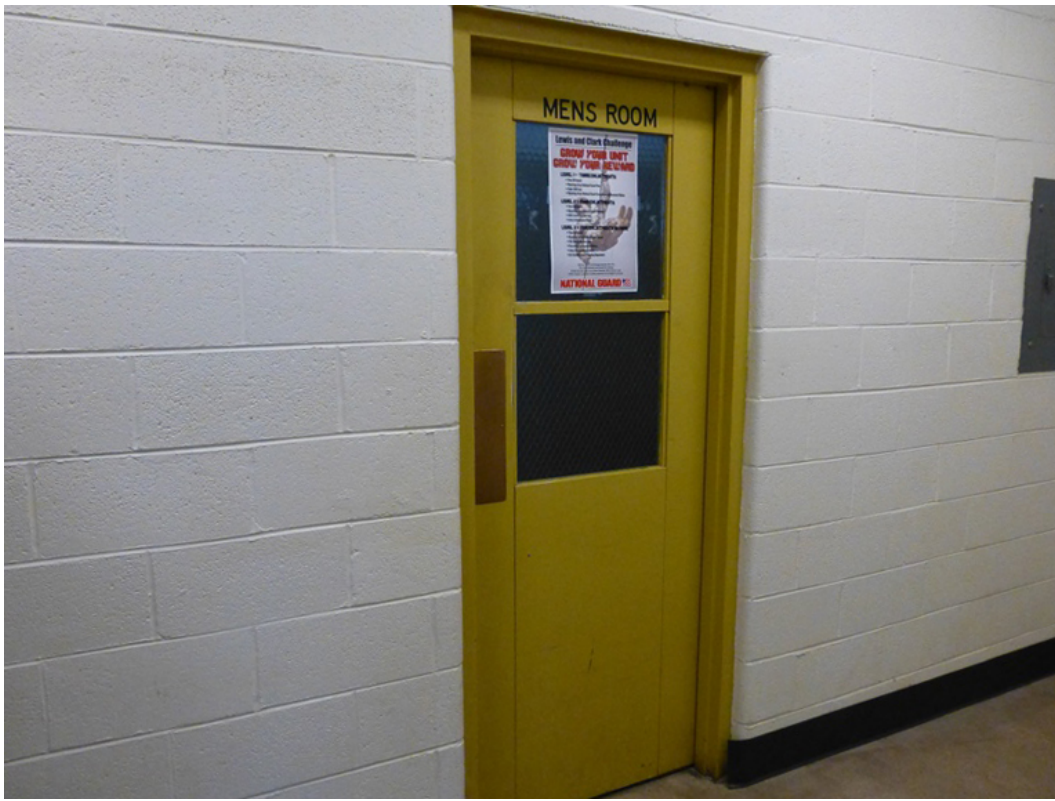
Laramie Armory, original metal door with glass panes, leading into the men's latrine (ERDC-CERL, 2015).
